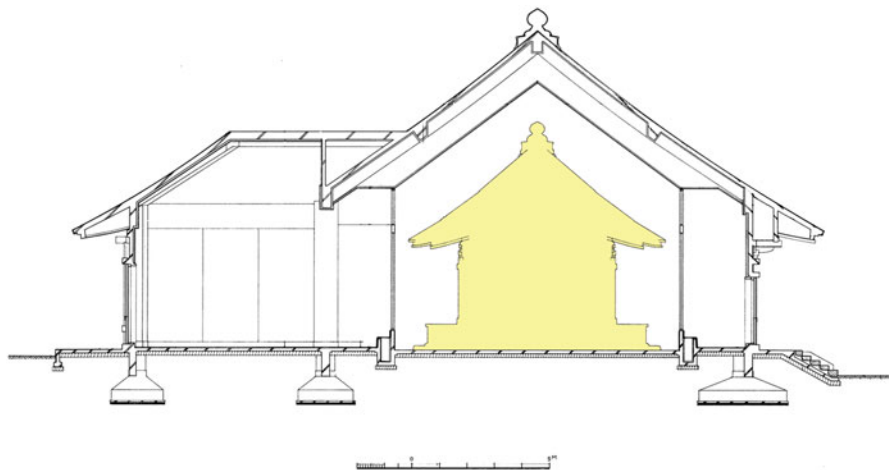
Chūson-ji Konjiki-dō. The cross section shows the famous Konjiki-dō hall, which is entirely gilded and protected by a reinforced concrete shelter built in 1965. Shelters for particularly precious and delicate architecture are not a recent invention. They can be found on quite a number of small Shinto shrines. *Source:* Chūson-ji Konjiki-dō Restoration Report 1968
